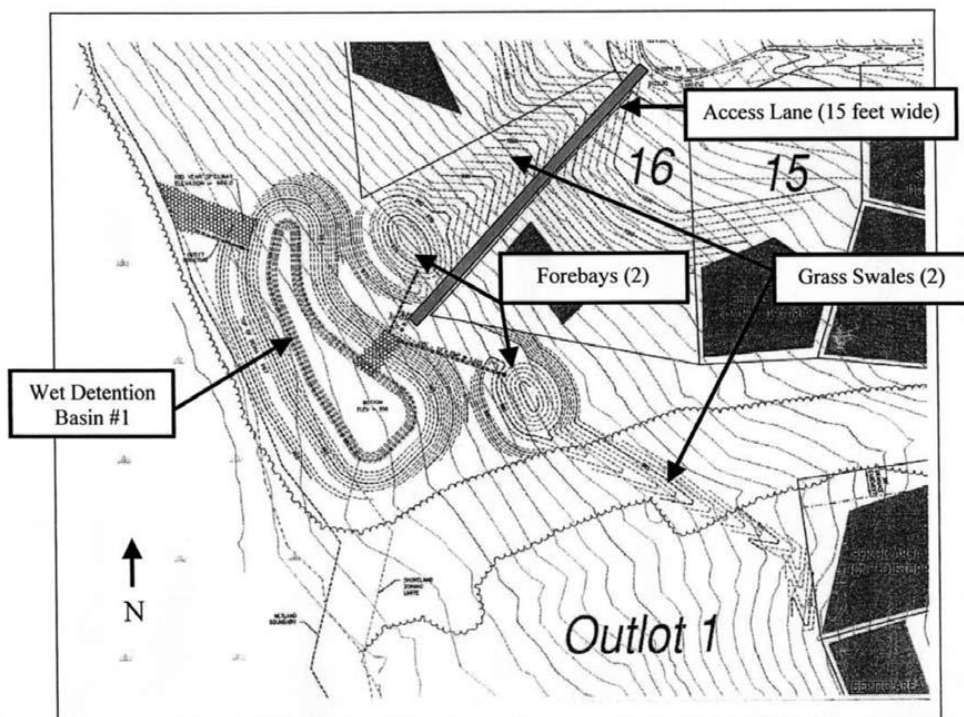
Exhibit D – Storm Water Practice Maintenance Plan (Sample)
